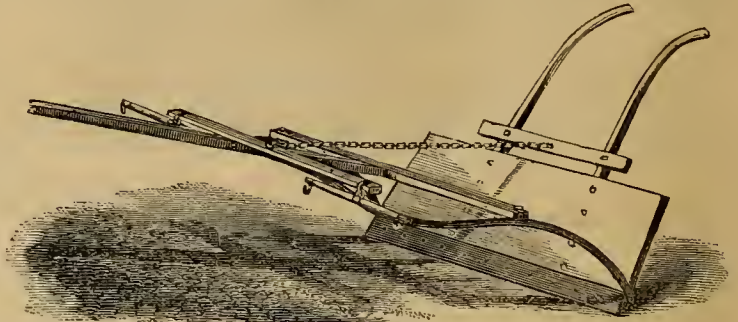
FLEXIBLE PLANK SCRAPER, LOADING.
